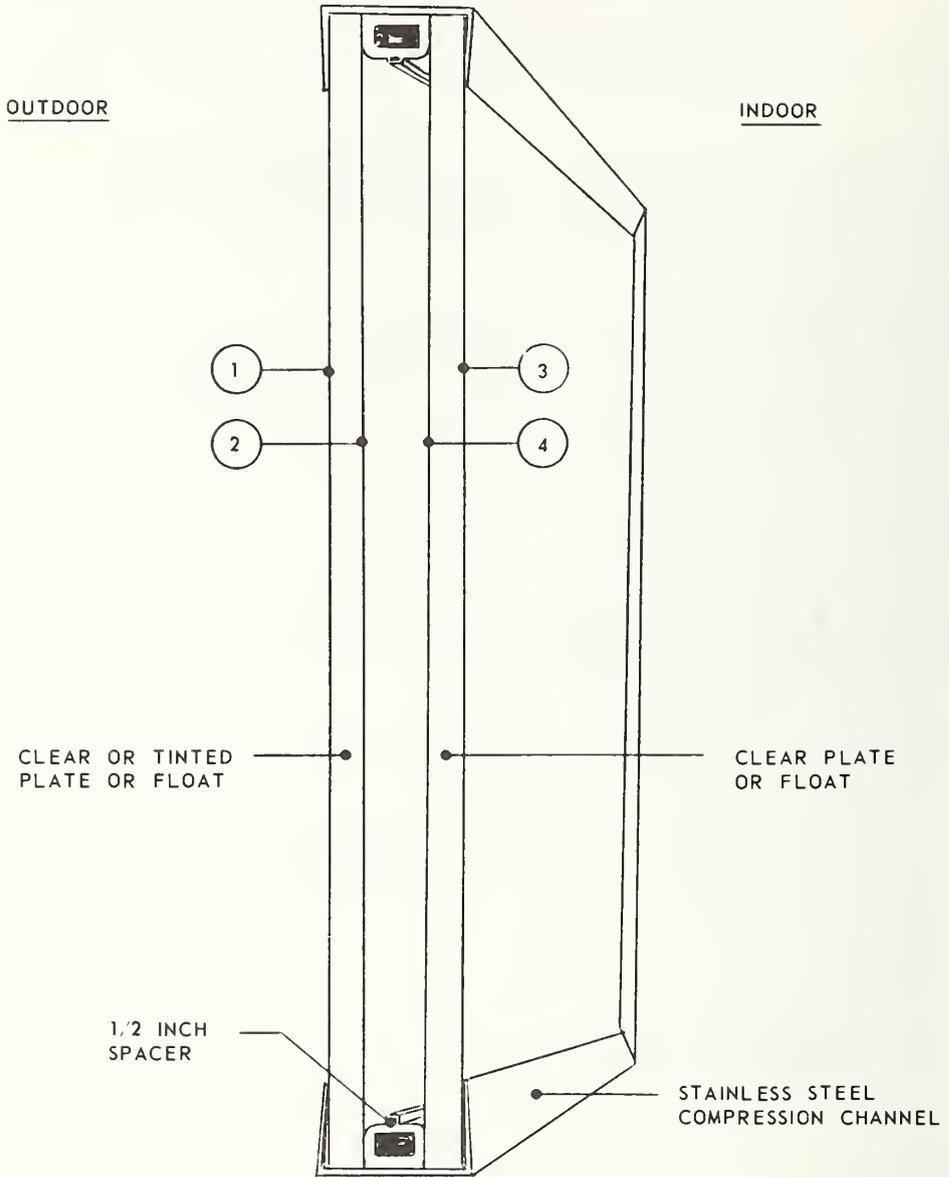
TYPICAL TWINDOW CONSTRUCTION
